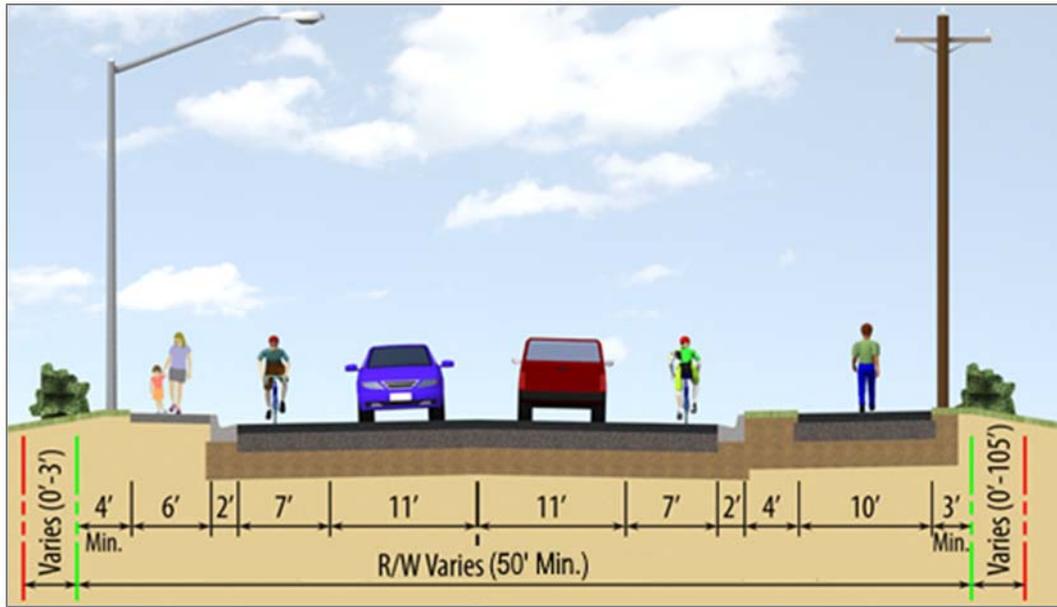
PREFERRED ALTERNATIVE ROADWAY TYPICAL SECTION
